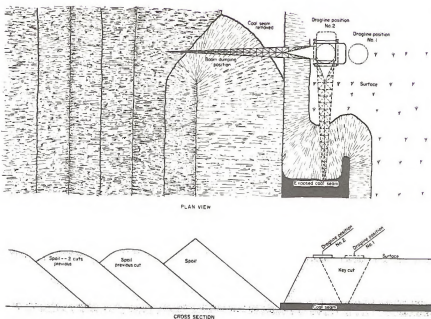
Cross-section and plan view of a portion of a strip coal mine.
